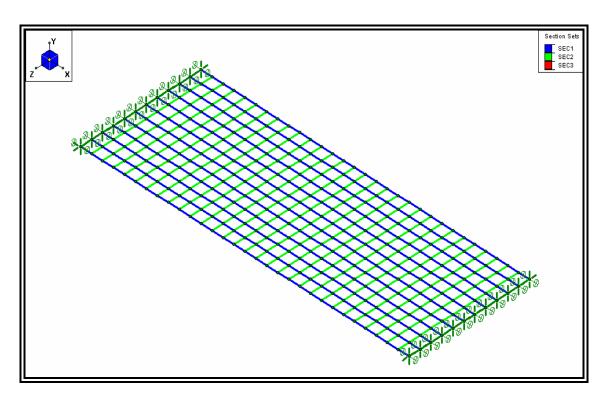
Typical Grillage Analogy Model of a Non-skew bridge
